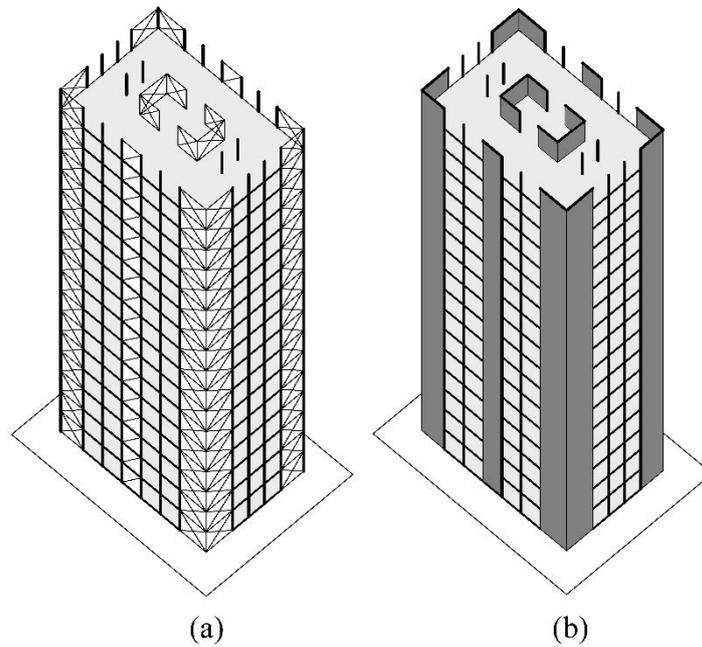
(a) Shear trussed frame (braced frame) system,
